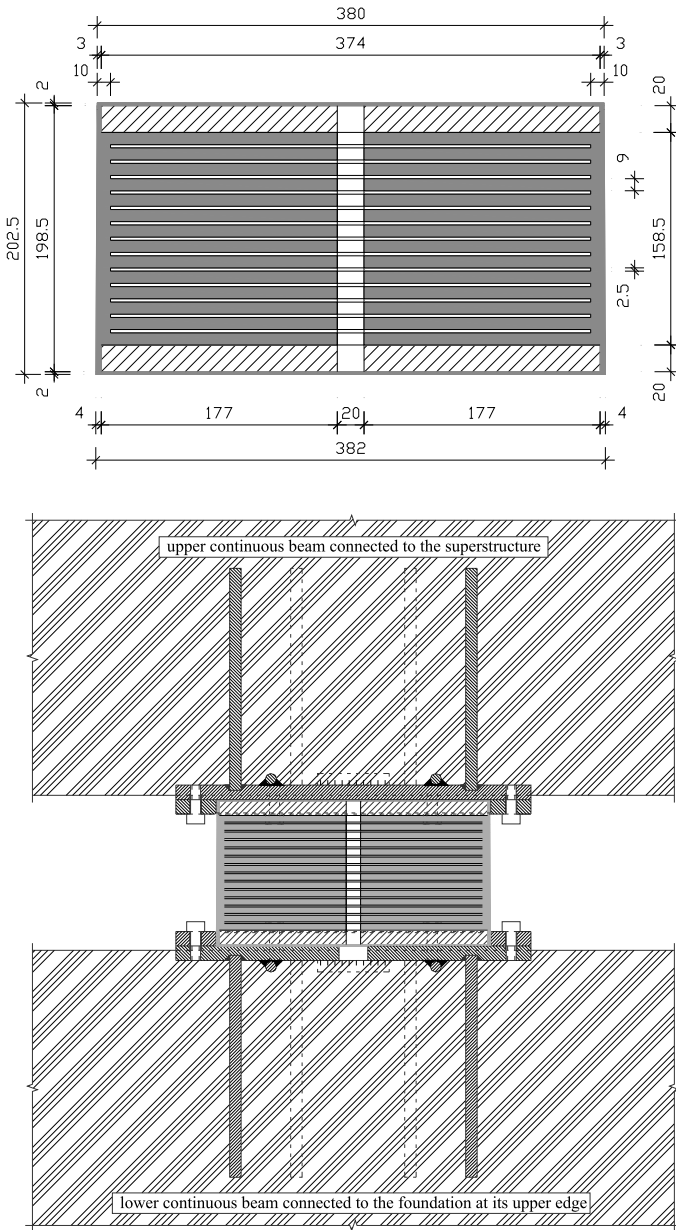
Geometrical dimensions of the designed HDRB for existing 5-story stone apartment building and location of HDRB by upper and lower recesses provided by annular steel rings bolted to the outer steel plates connected to reinforcement in the upper continuous and lower foundation beams
